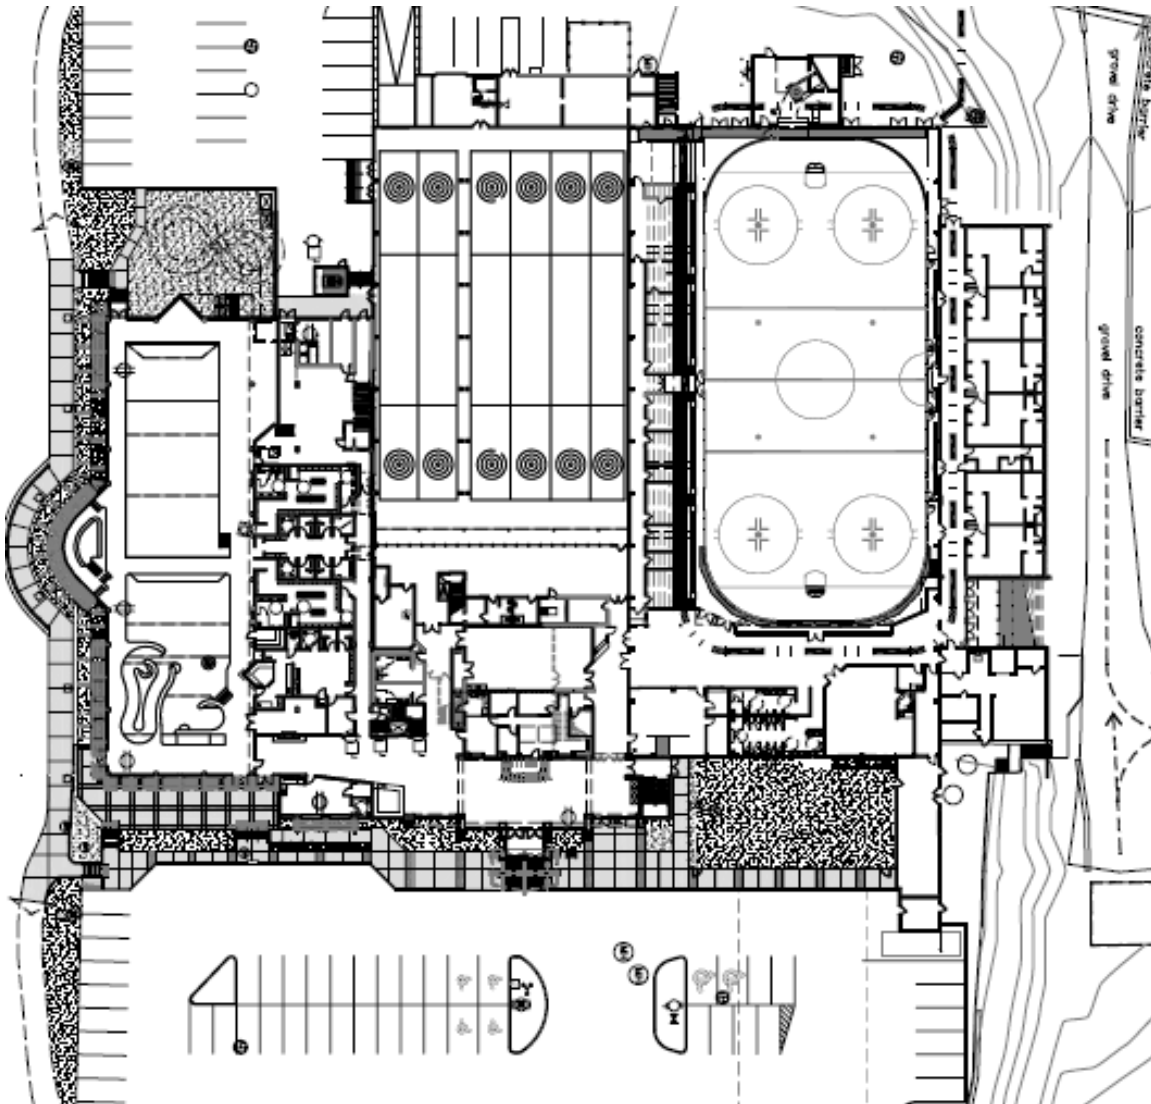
CDCC site layout located at 312 – 9th Ave. N., Creston, BC
